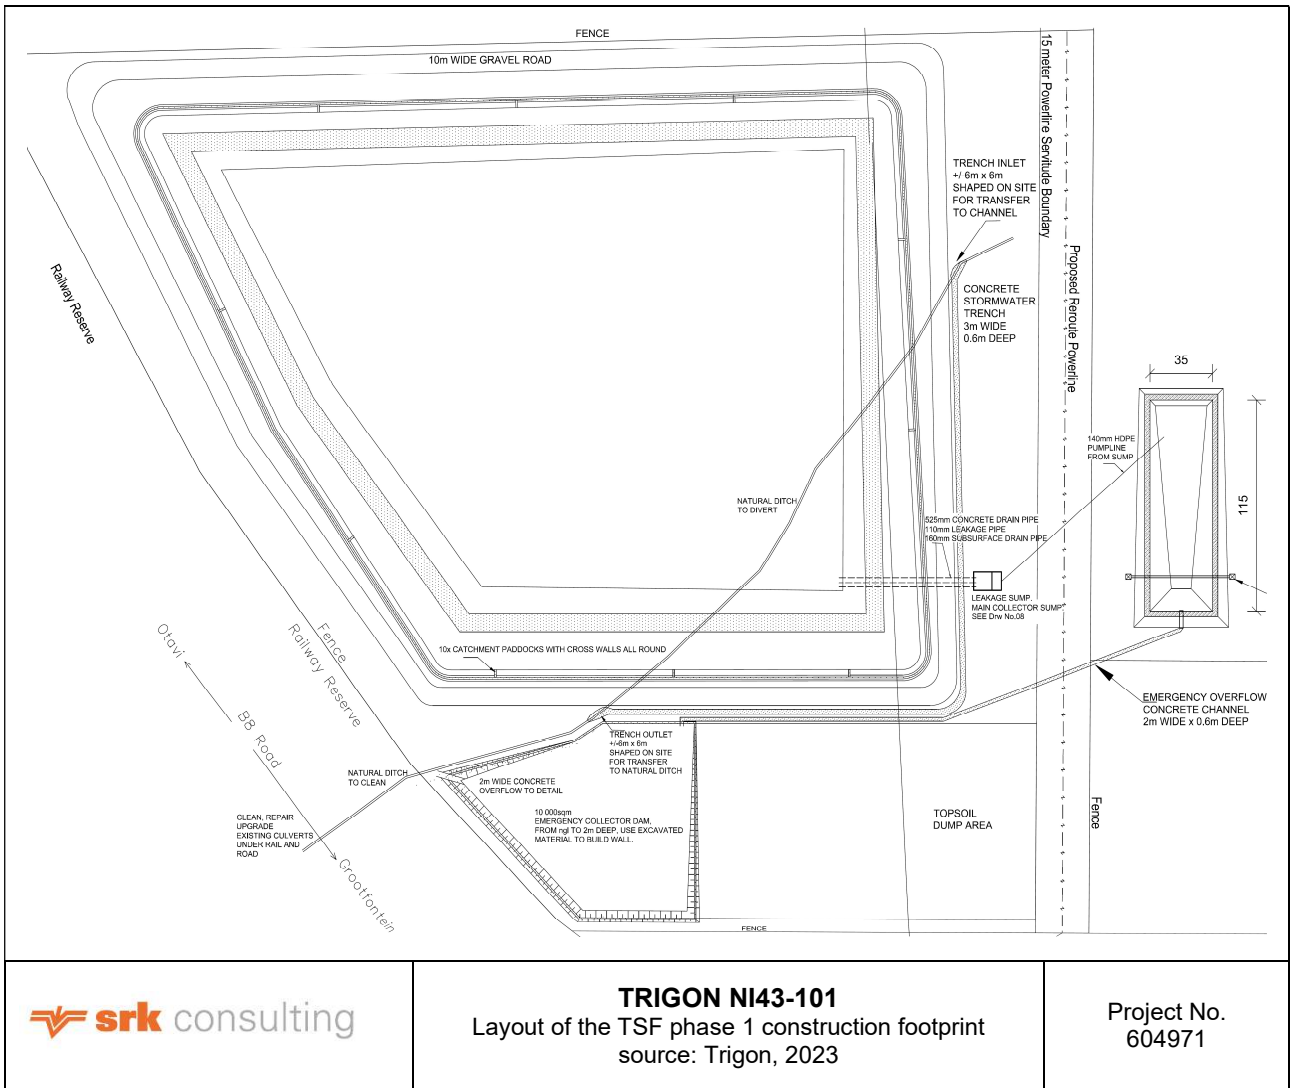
Layout of the TSF Phase 1 Construction Footprint
